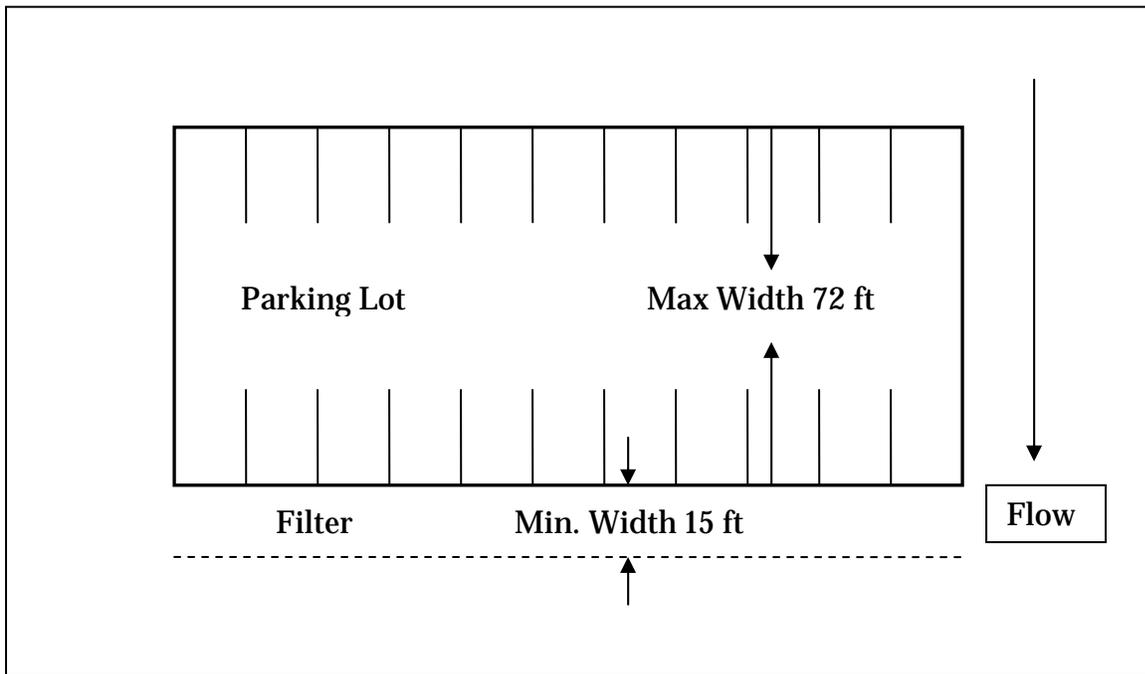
Example configuration of filter strip adjacent to parking lot in plan view.
